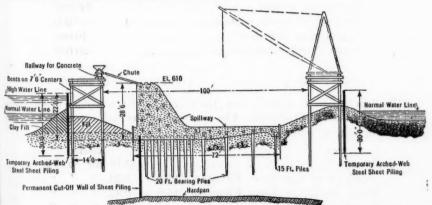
Cross-Section of Coffer-Dam for Concrete Spillway of Dam, Decatur, Ill.
